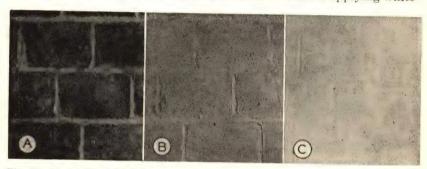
Cinder Block Wall Dampened for Whitewashing, (A), Appearance of Wall Immediately after Application of Whitewash, (B), and the Same Wall after Drying, (C)
